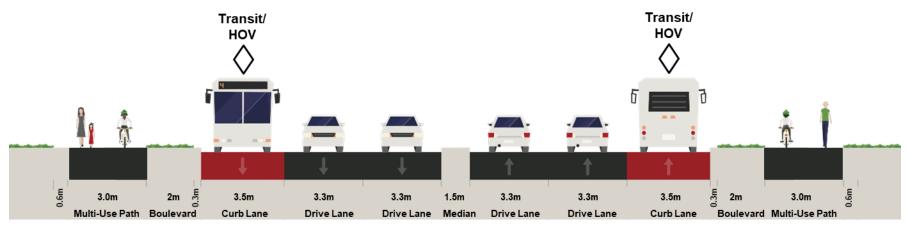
Alternative 1 –At-grade crossing with AT Improvements
